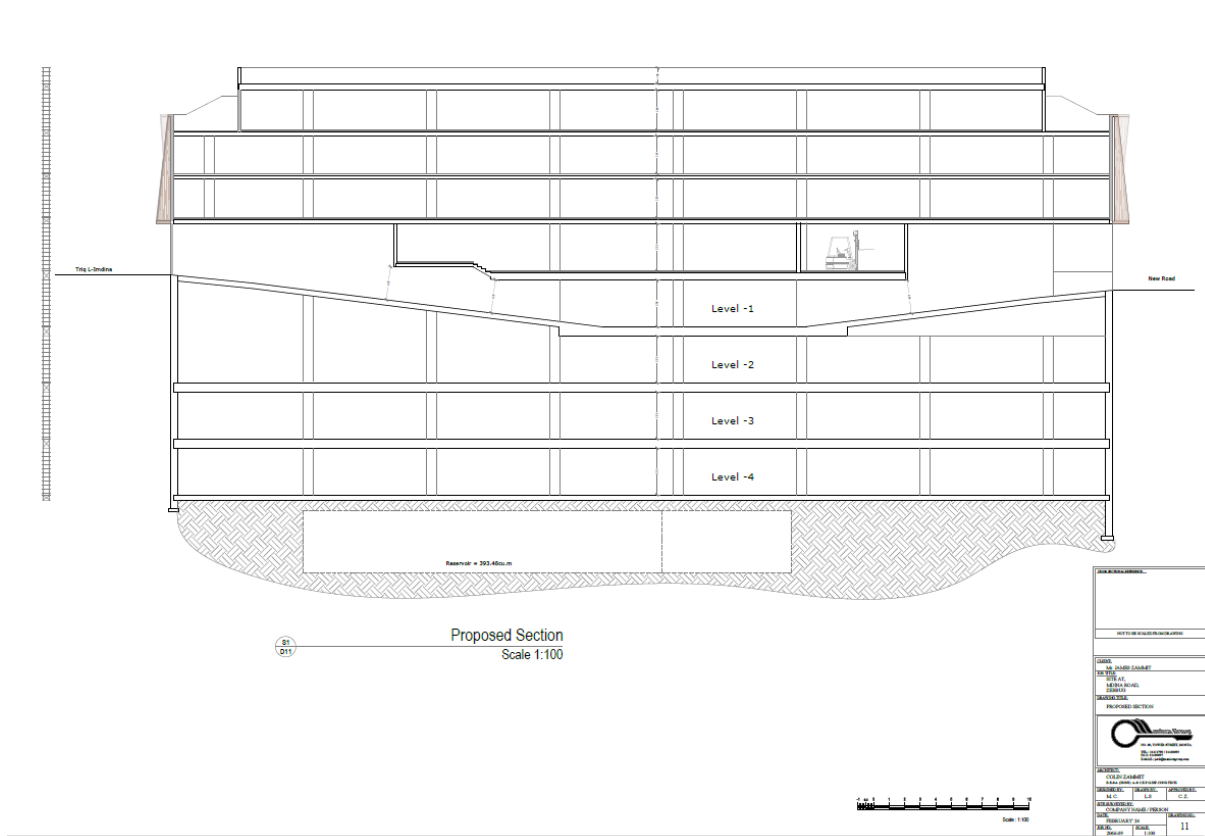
Proposed section (Source: E-Application PA/00452/23/46k)
